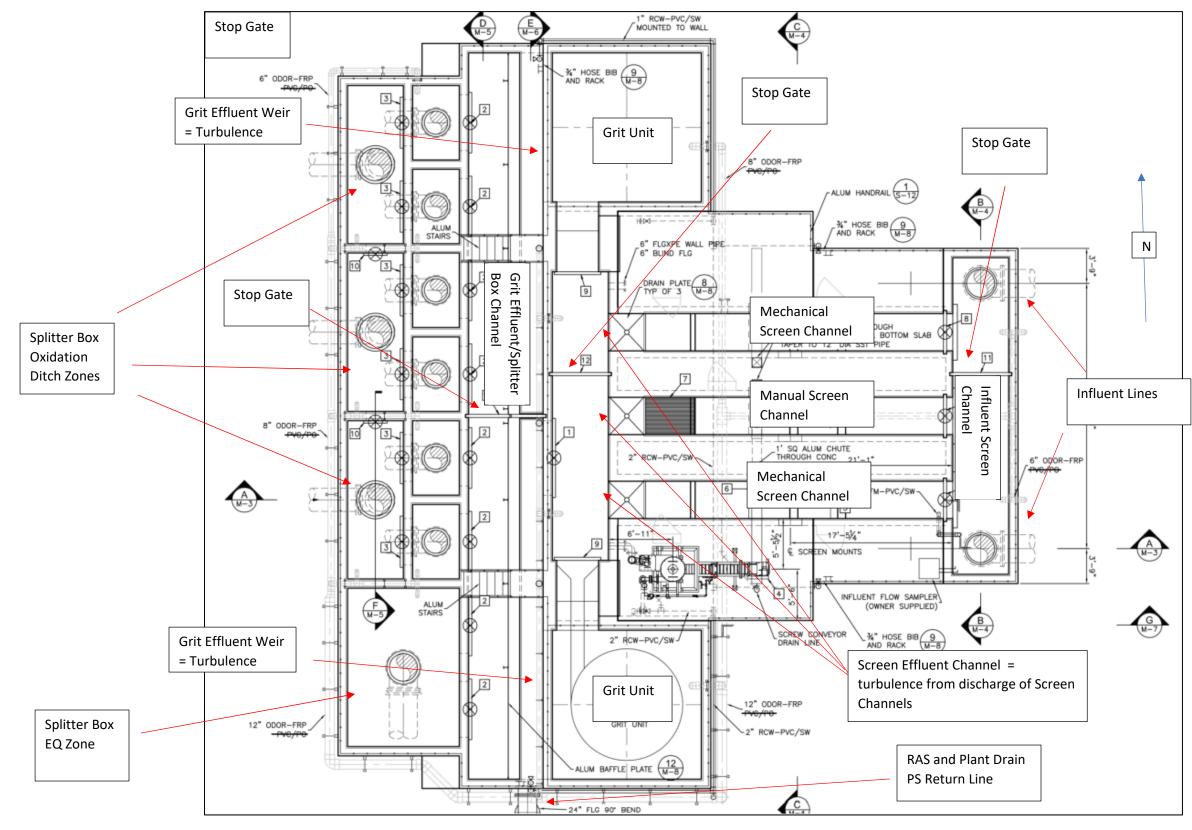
Manatee NRWRF Headworks & Splitter Box Layout Plan View
